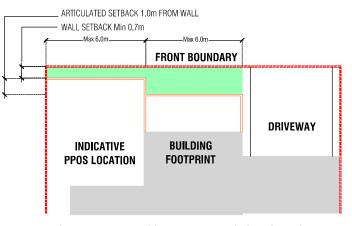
EXAMPLE - COURTYARD WALL, SHOWING ARTICULATED PLANTING ZONE SETBACK
